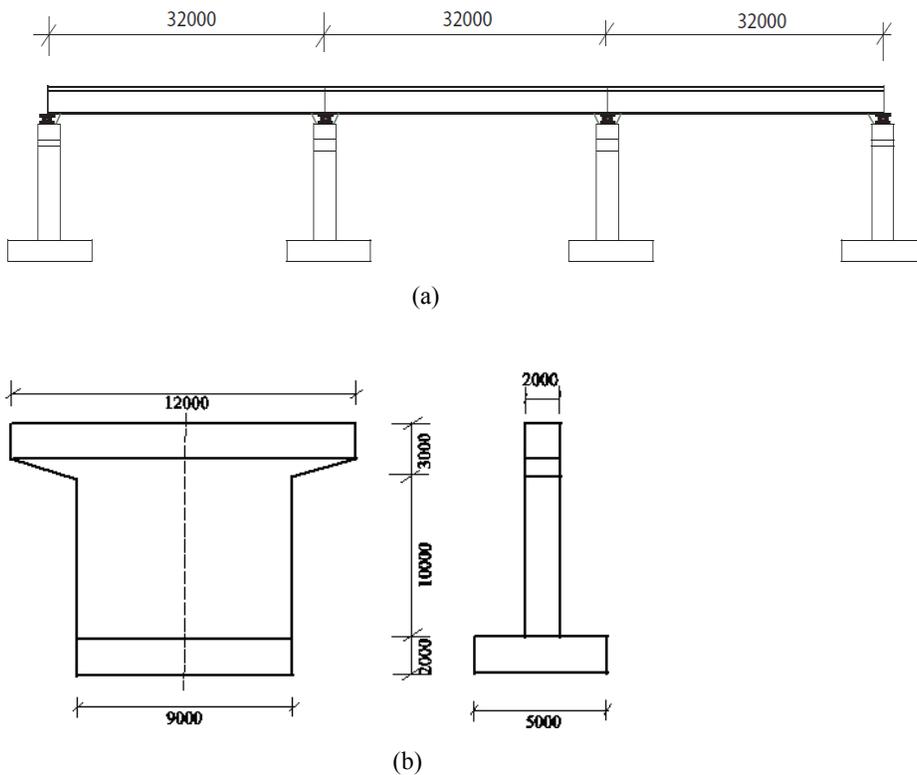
Geometric details of the bridge (a) longitudinal view of the bridge, and (b) transverse and longitudinal view of the bridge pier; all dimensions are in mm.
